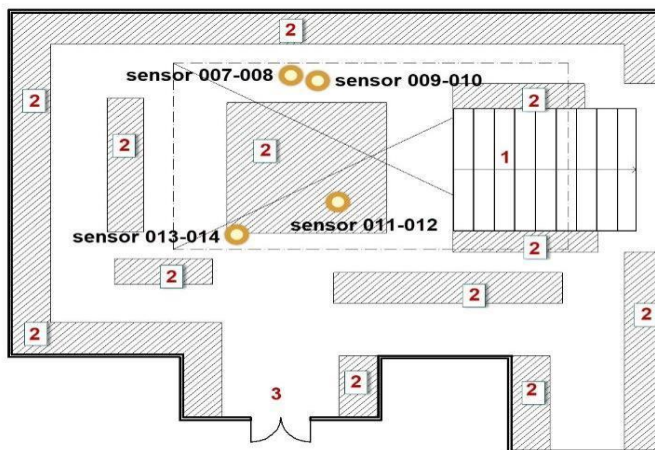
Basement floor: (1) Down stairs, (2) Exhibition areas, and (3) Emergency exit. Note: sensors 007-008 and 009-010 are hanging between the two floors
